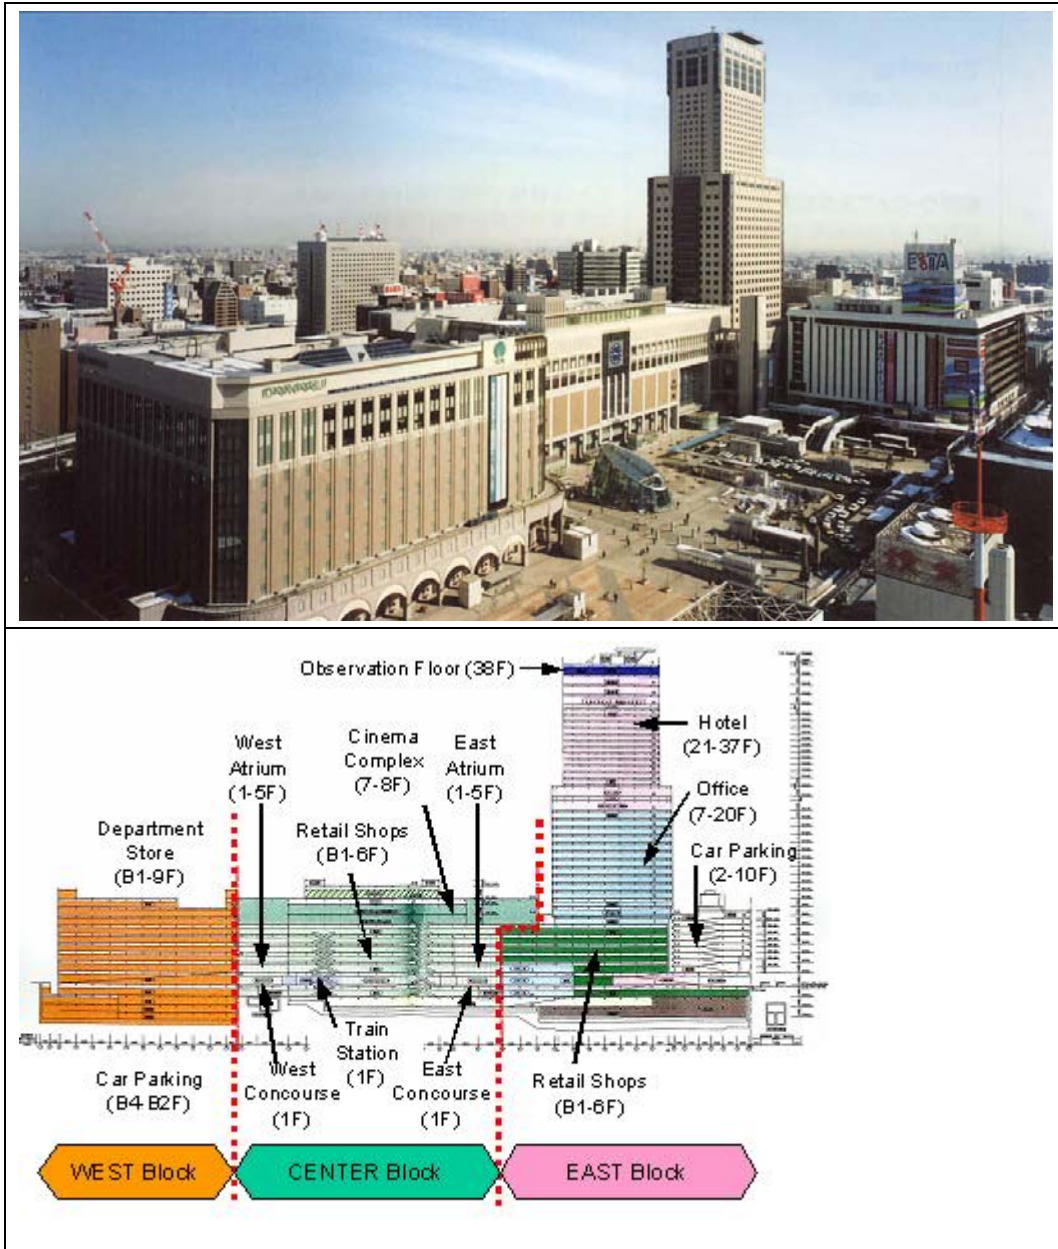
Exterior view and cross-sectional schematic diagram of Sapporo Station Building
